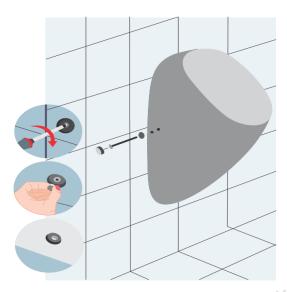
Fitting of mounting screws and tightening into L shaped brackets
